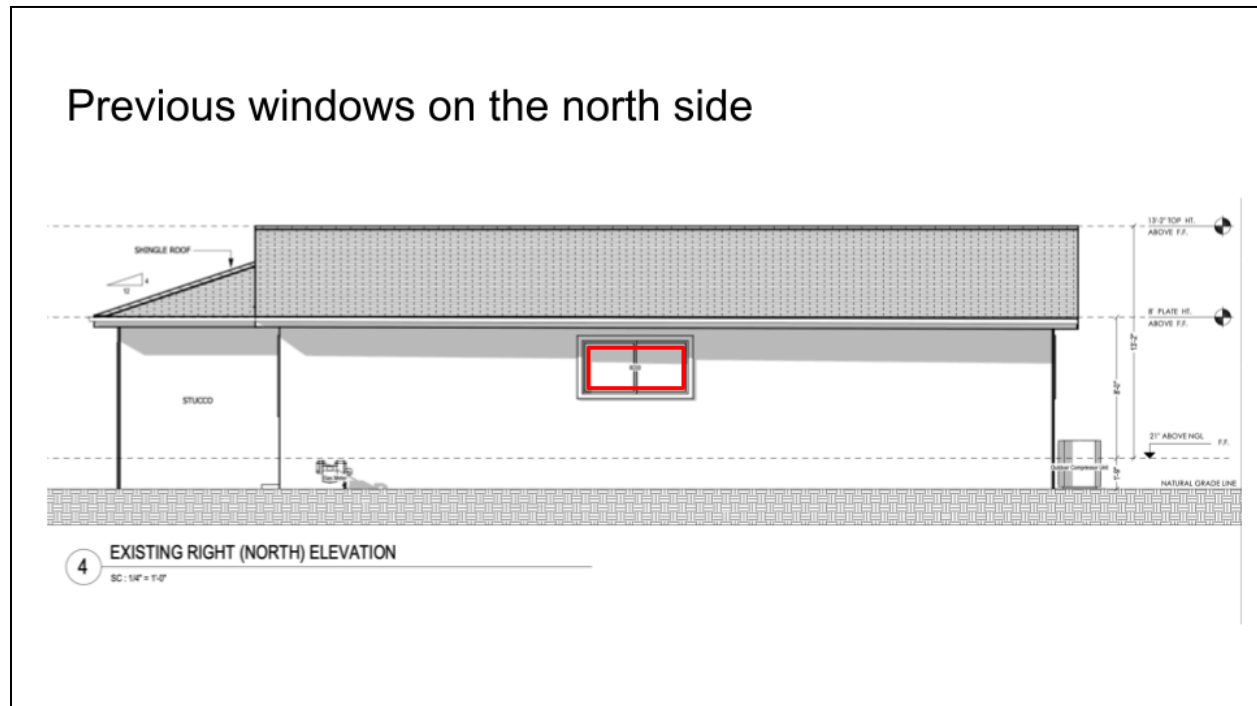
Previous window (only 1) of 1585 Mallard Way facing our property
